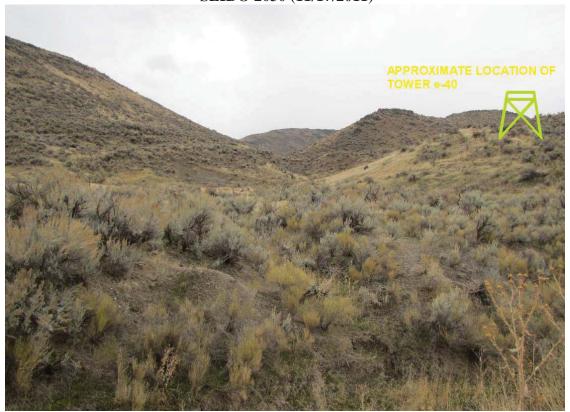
Looking south towards tower 1043 (formerly tower e-40) and SLIDO 2030 (11/17/2011)
